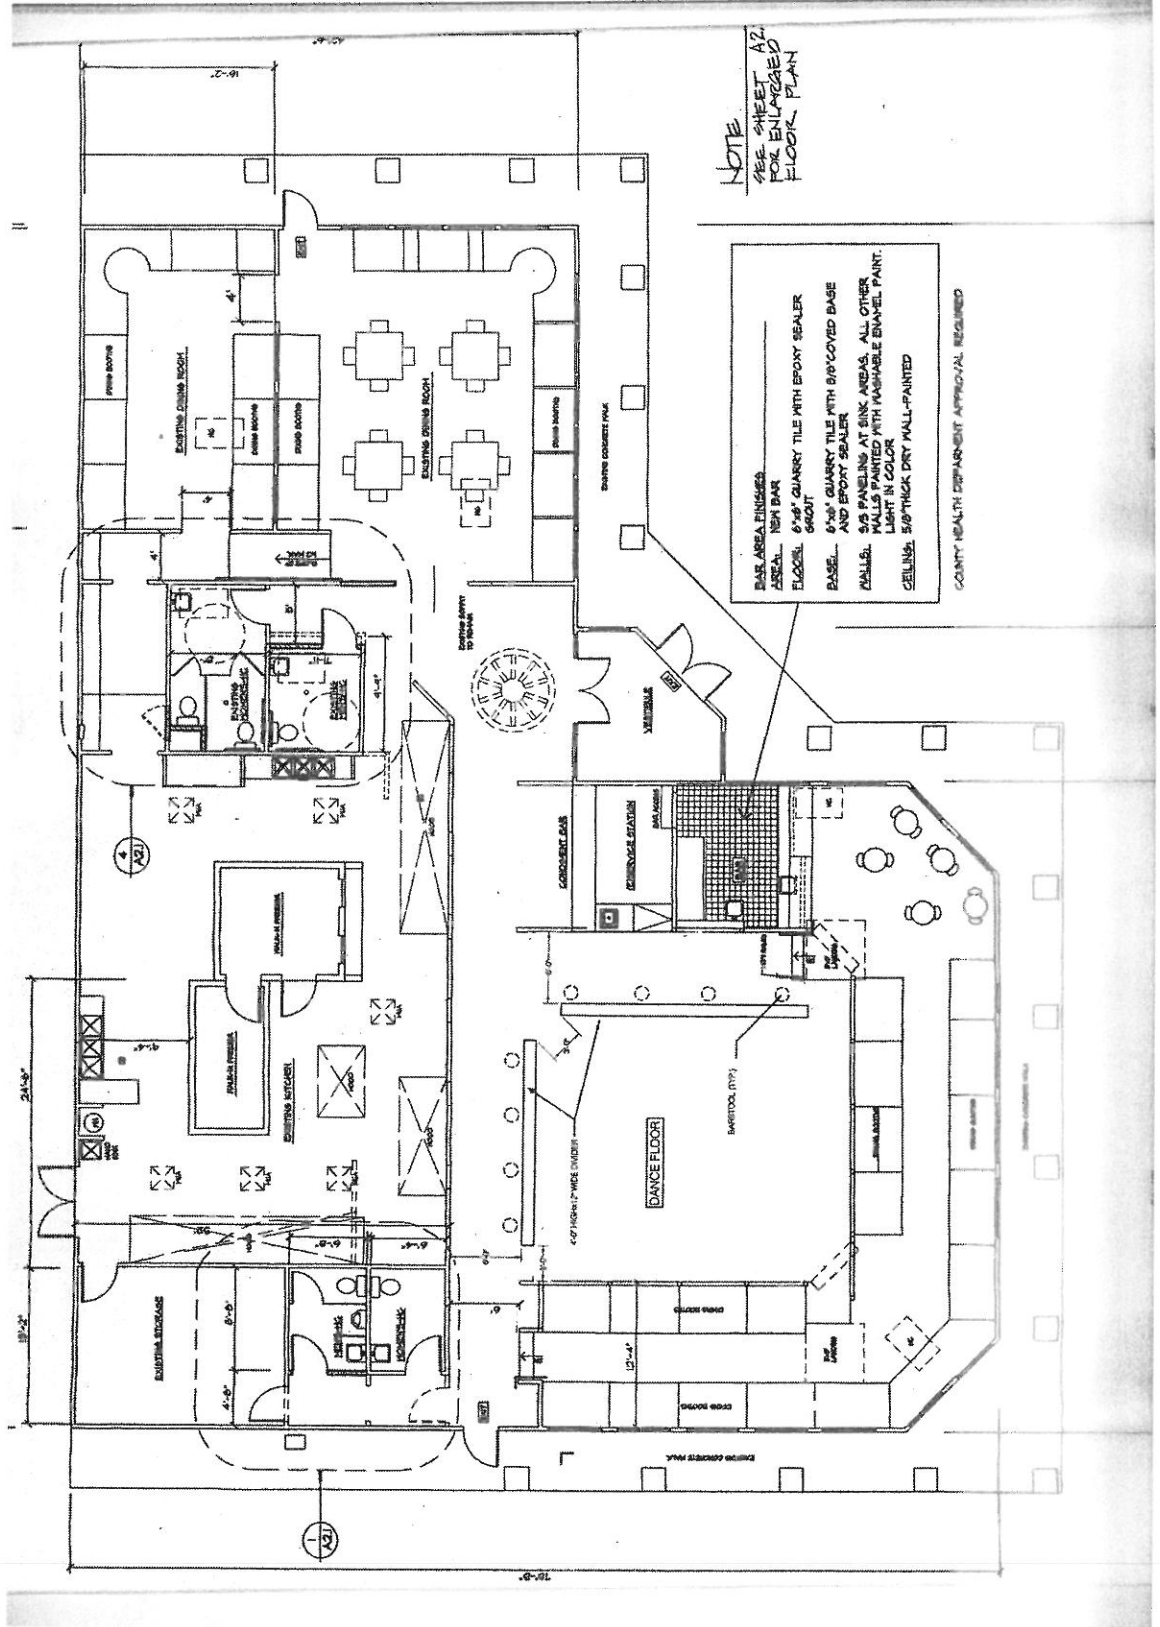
EXHIBIT "D"—ENLARGED FLOOR PLAN (EXISTING)
